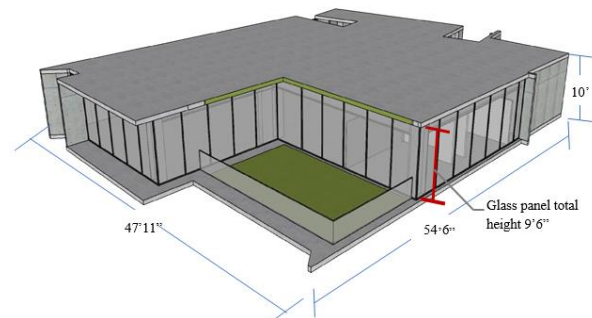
3D Model of level-3 office floor of Square Food and Beverage Ltd building. Source: Author
